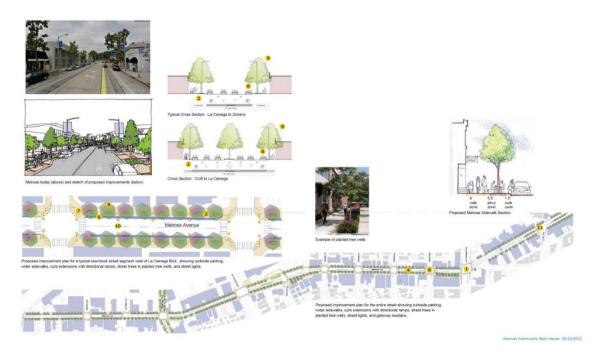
Melrose Avenue improvement plan, taken from weho.org for the West Hollywood Design District Streetscape Master Plan
